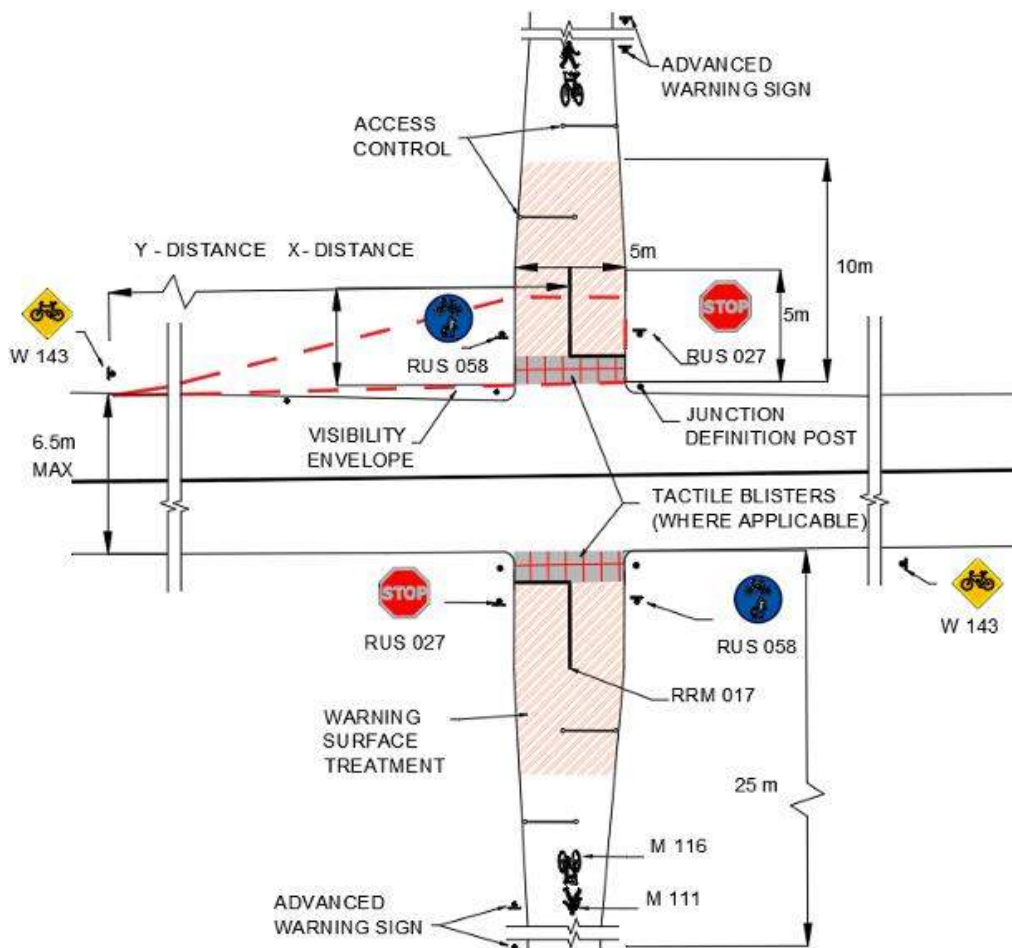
Typical Road Crossing Detail from TII Publication DN-GEO-03047
